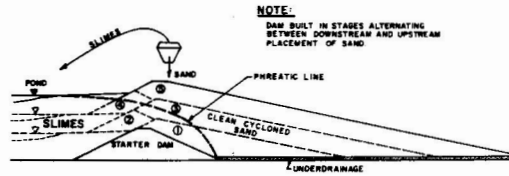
SAND TAILINGS DAM CONSTRUCTED BY DOWNSTREAM (CENTRELINE) METHOD
